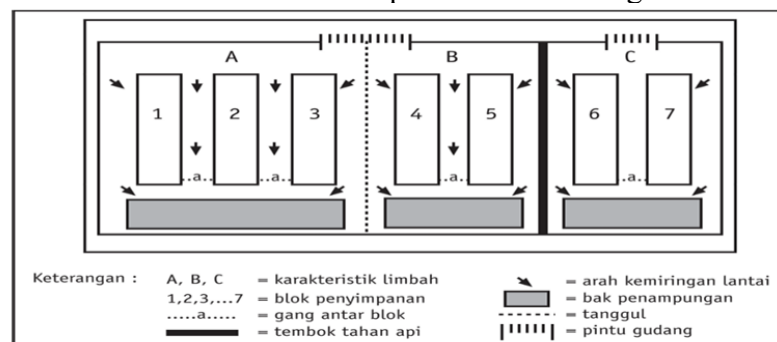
Layout illustration of a B3 Waste Storage Facility designed in the form of a warehouse
